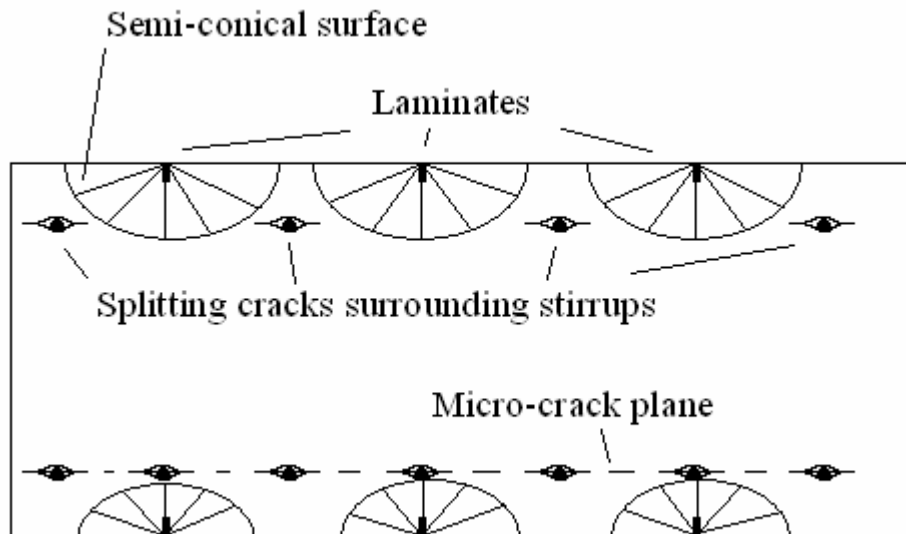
Section of a strengthened beam parallel to the shear crack and splitting cracks surrounding stirrups.
